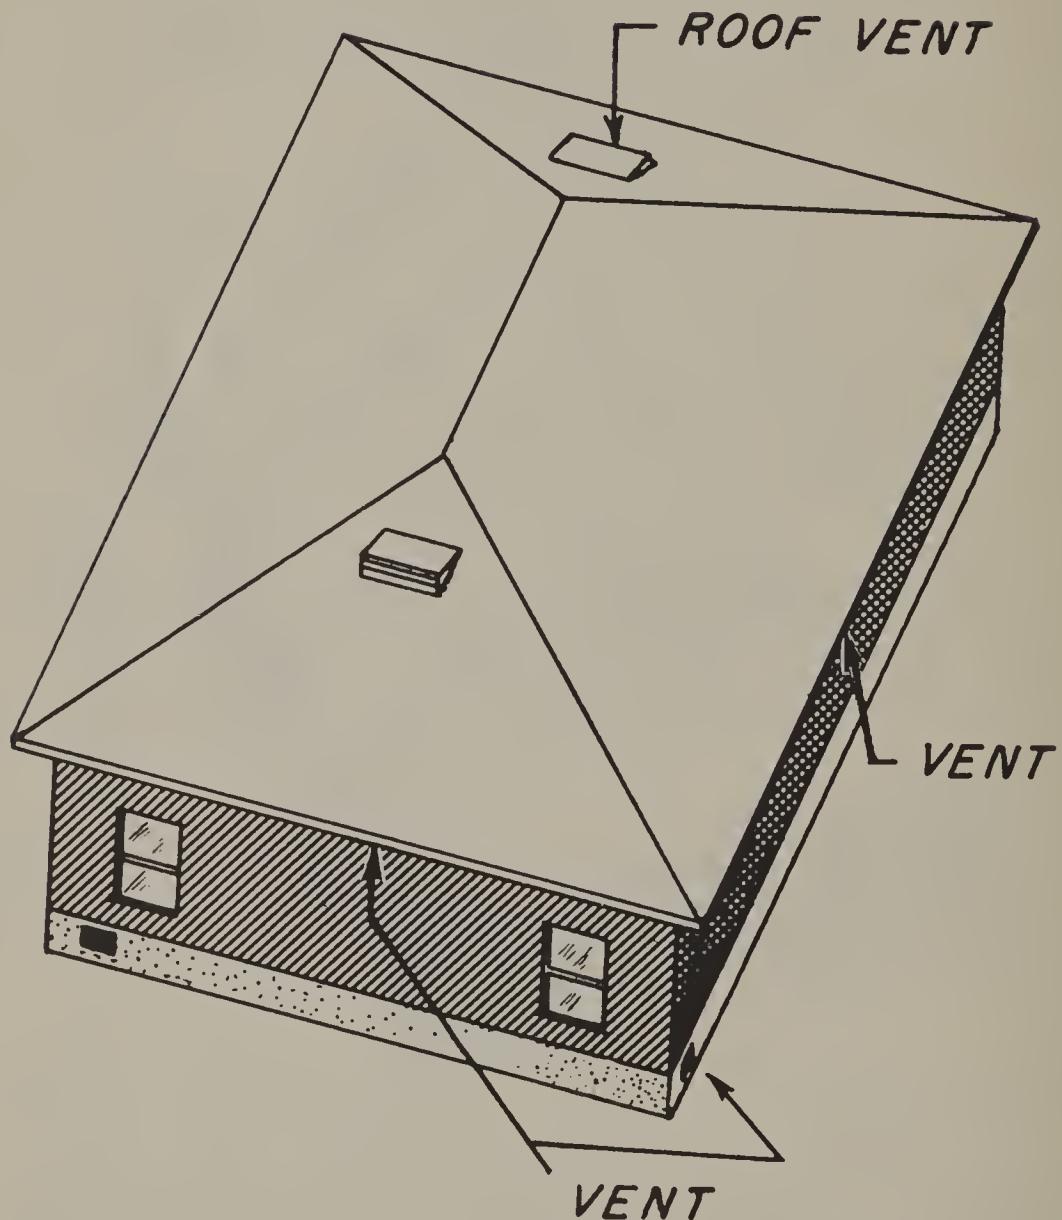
Special roof vent for hip roof.* This type of construction is designed to provide condensation control in the form of roof ventilation. The detail shows a small vent that should be located near the peak of the roof and with supplementary vents below the eaves. Figure 48 illustrates the general design of a roof ventilator of the type shown in this sketch. Crawl-space vents are also indicated in the foundation of the building.
